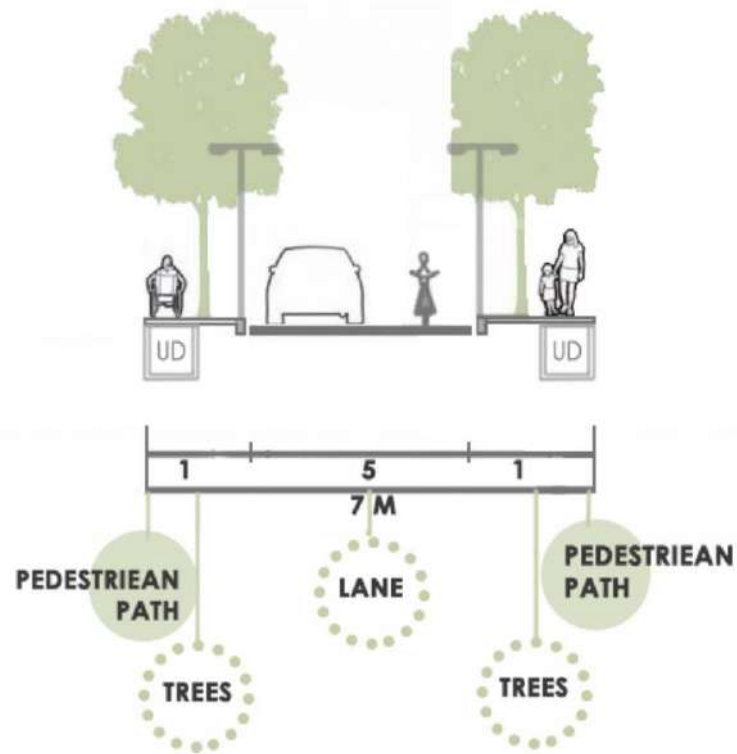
Typical layout of proposed 7m road except the proposed road parallel to the proposed vending zone (All Dimension in meter)
